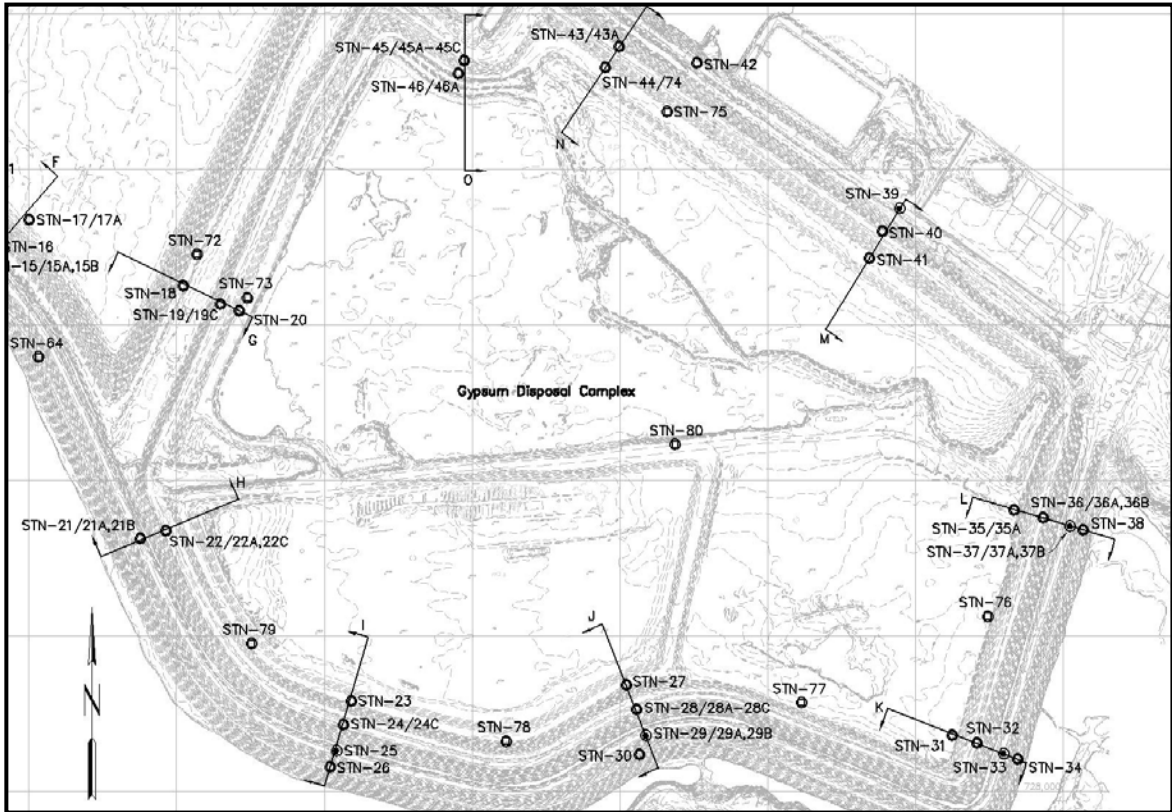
Plan View of the Gypsum Stack Complex and the Stability Cross Sections
